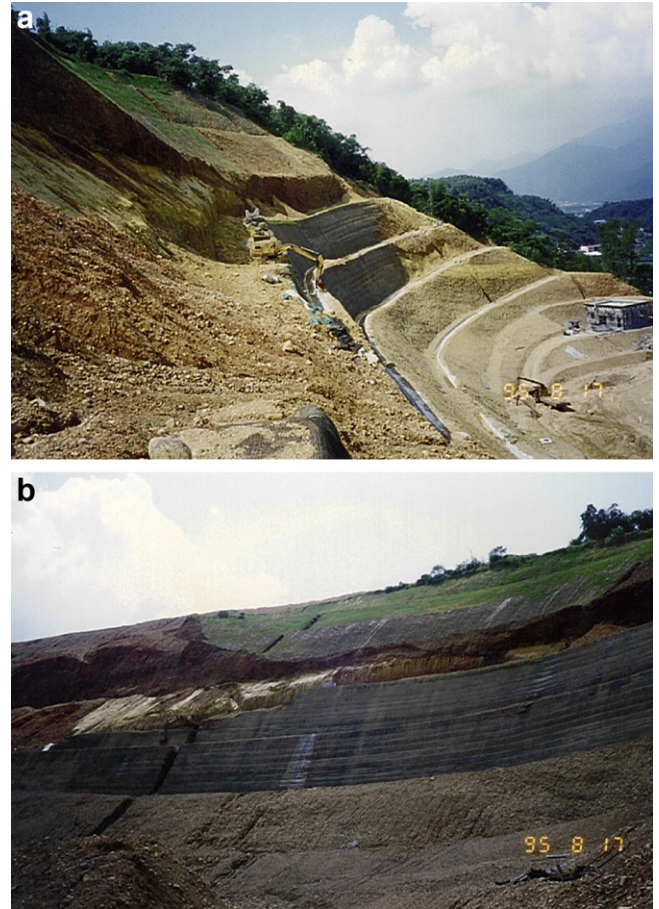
Failure of reinforced slope at Section A-A during construction in 1994: (a) side view; (b) front view.
